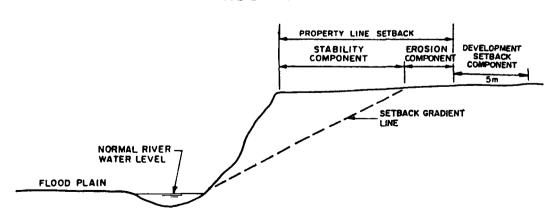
FIGURE IC: OVERSTEEPENED VALLEY WALL SLOPE SUBJECT TO TOE EROSION
